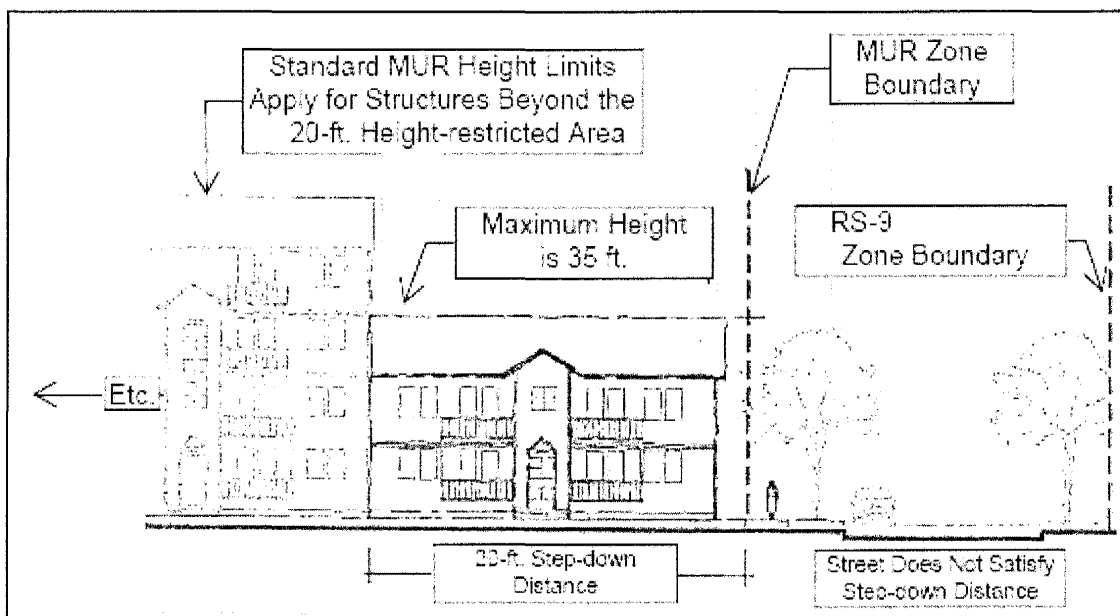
Required Height Transition Area When a Development is Zoned MUR and is Next to Land Zoned RS-9
